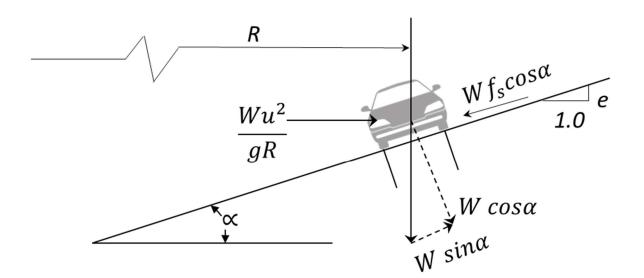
Forces Acting on a vehicle Travelling on a Horizontal Curve Section of a Road.
